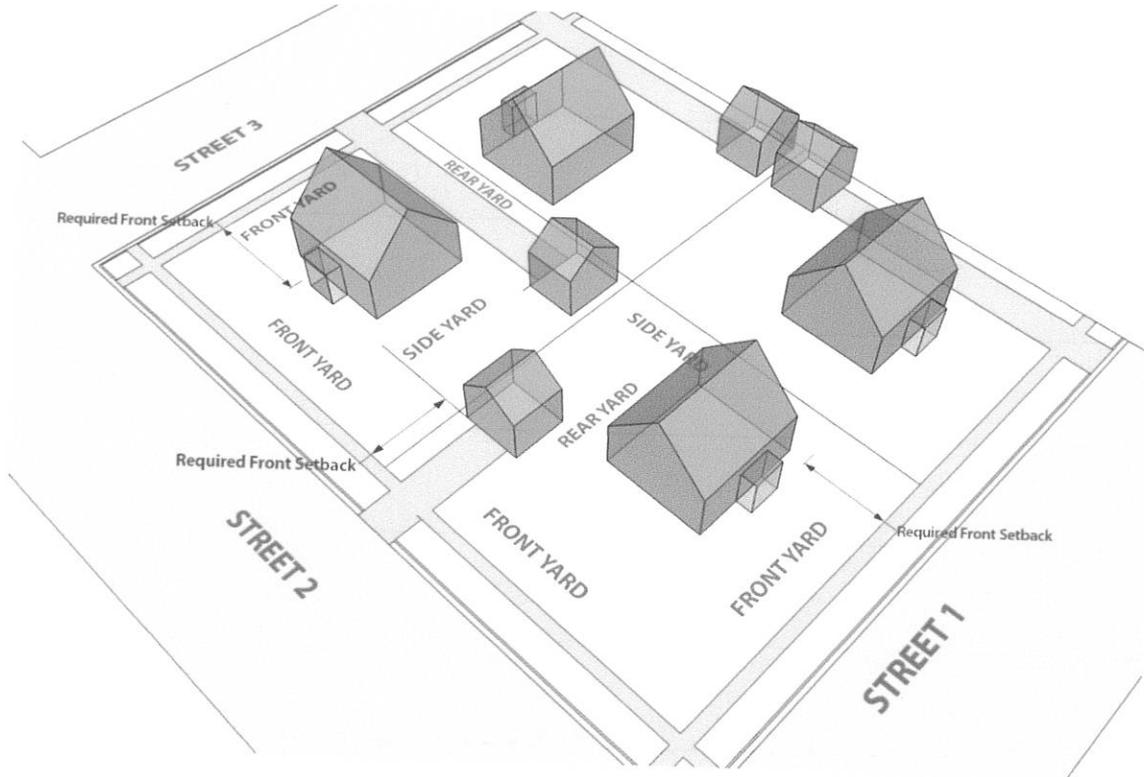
Accessory Building Location for Corner Lots with Side-Side Yard Situations
